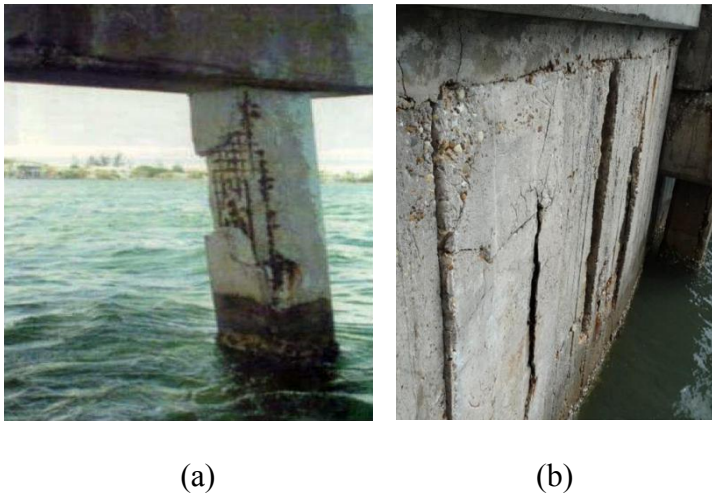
Degradation of RC structures due to seawater erosion and steel reinforcement corrosion: (a) bridge column (Mohammed, 2015); (b) seawall (Nolan et al., 2021).
